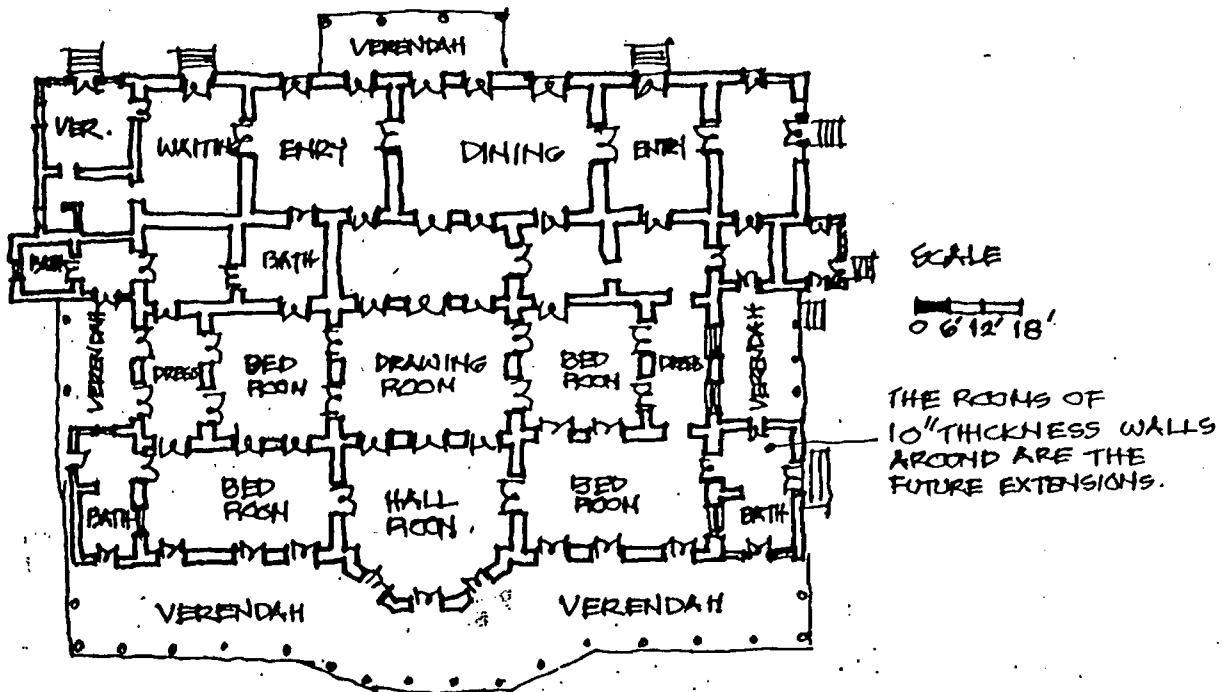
Ground floor plan, bungalow of Commissioner, Chittagong
